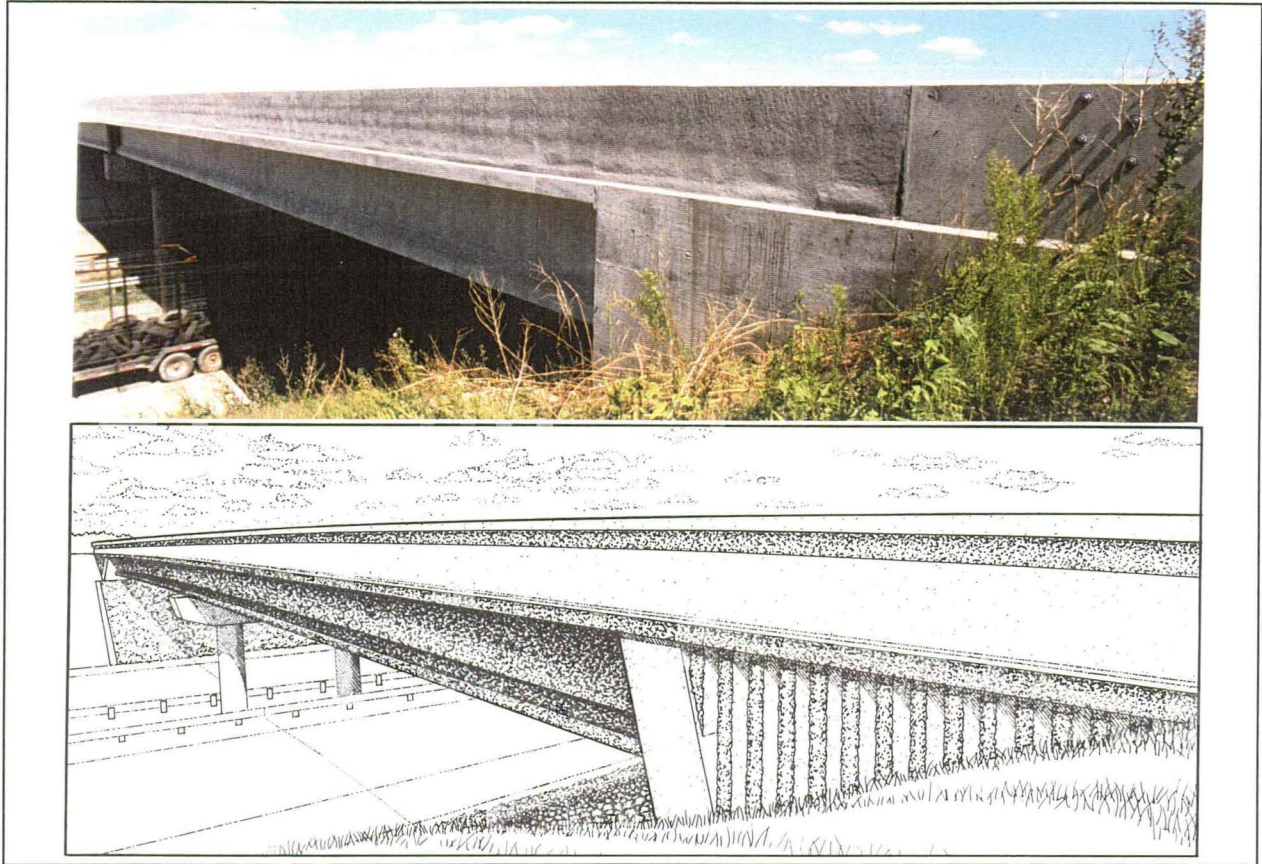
Proposed Abutment Modifications - Battered Maskwall and Overhanging Slab at the Wings
